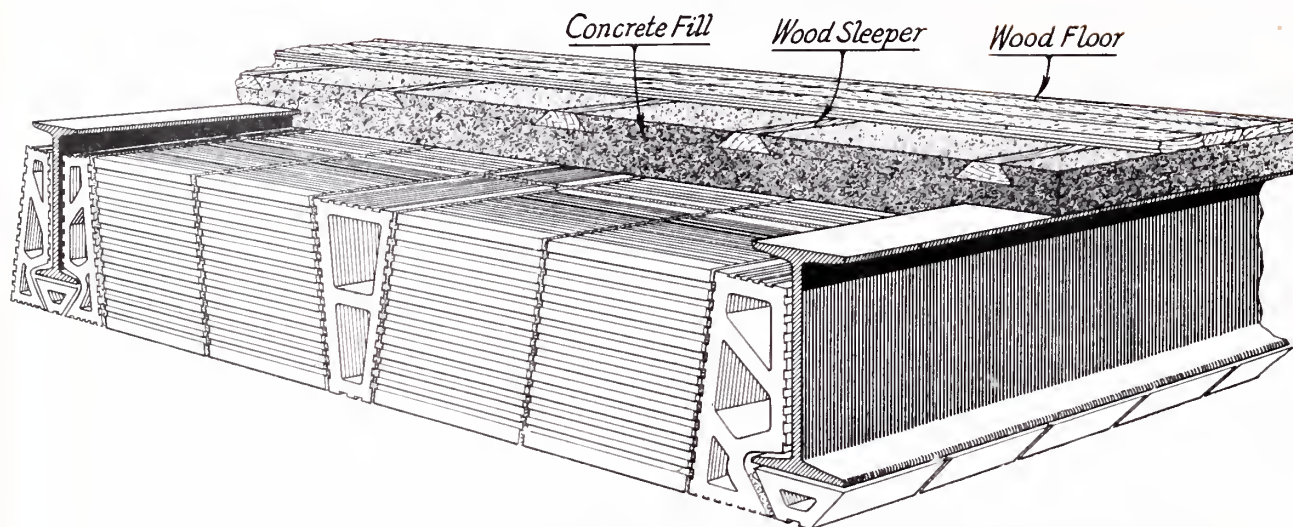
Section of End Construction Flat Arch with side construction skews and with wood floor, illustrating placing of units, concrete fill, and sleepers for finished floor.
